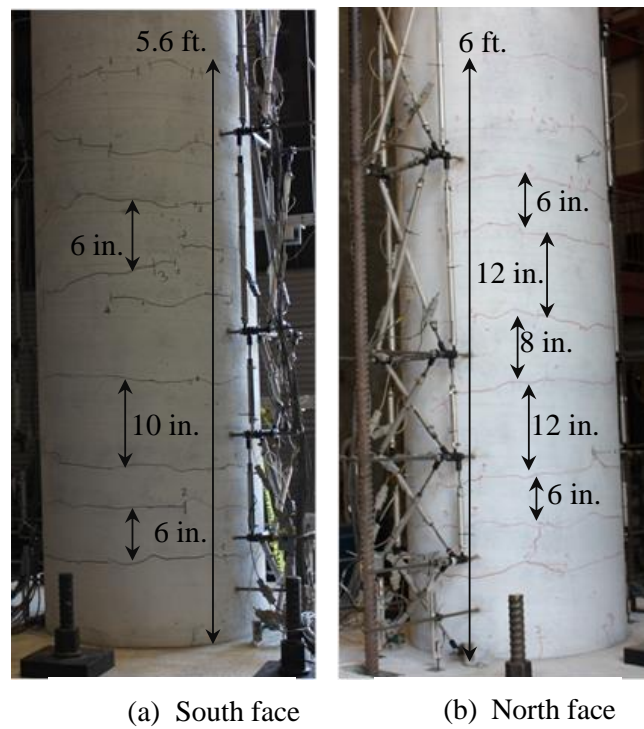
Flexural cracking in Specimen #2 at 1% drift
